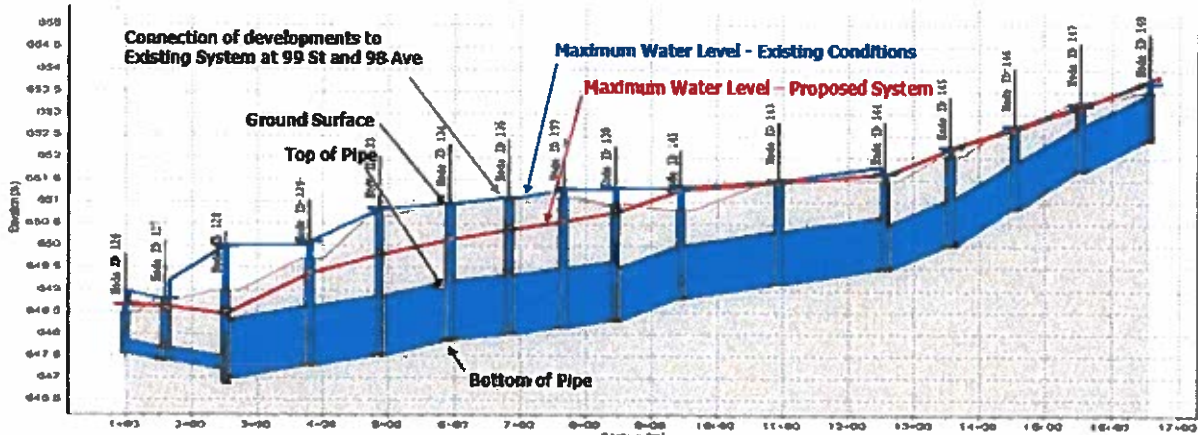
PROPOSED STORMWATER MANAGEMENT SYSTEM
